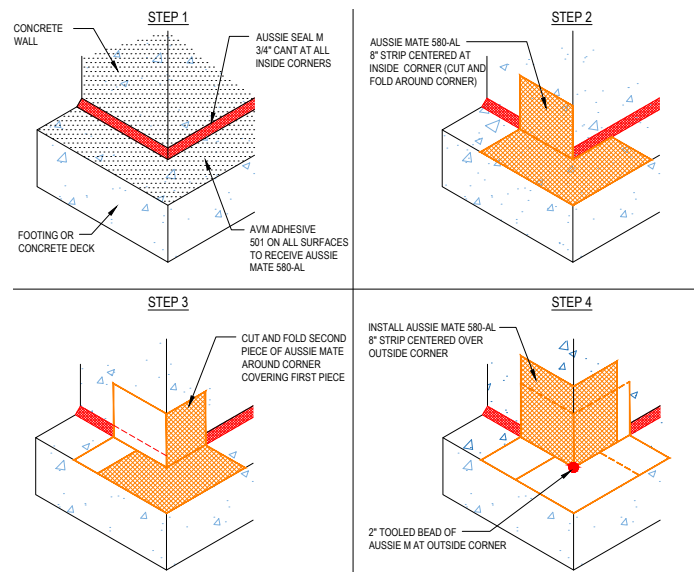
OUTSIDE CORNER DETAIL
